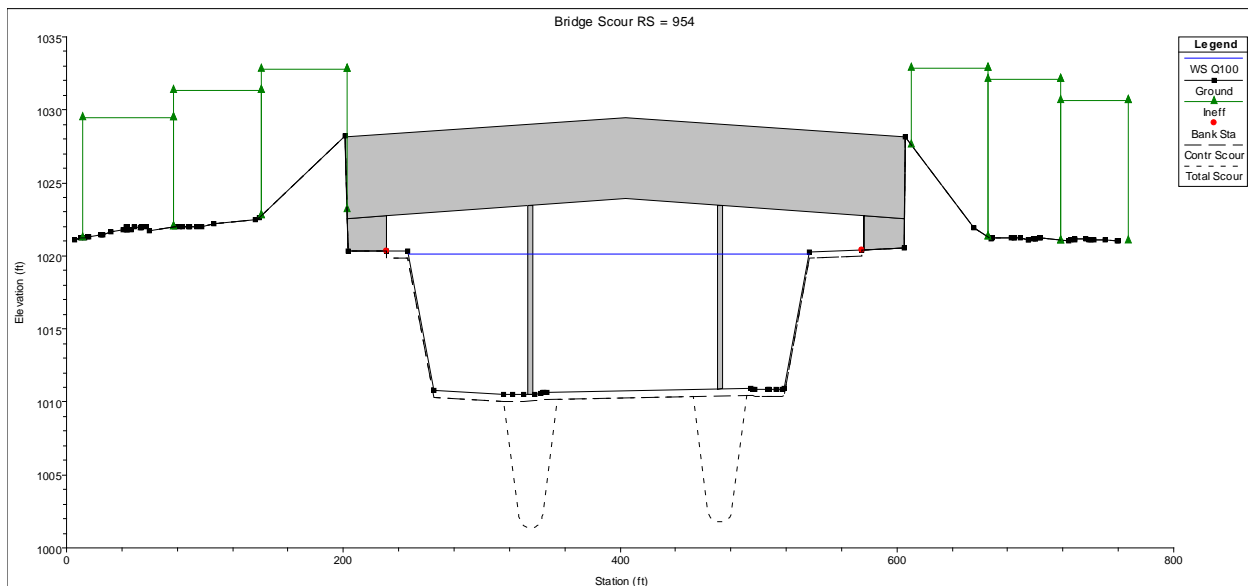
Scour of Proposed Bridge Piers in Interim Condition for Q100.
